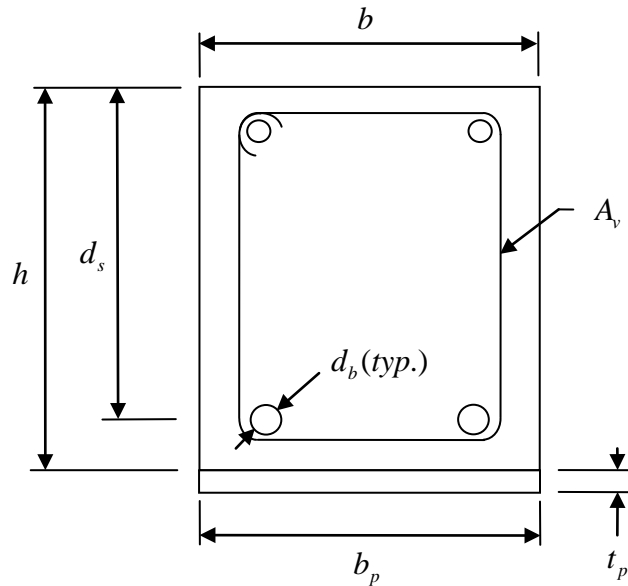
Typical Specimen Cross-Section used by Oehlers (1992)
